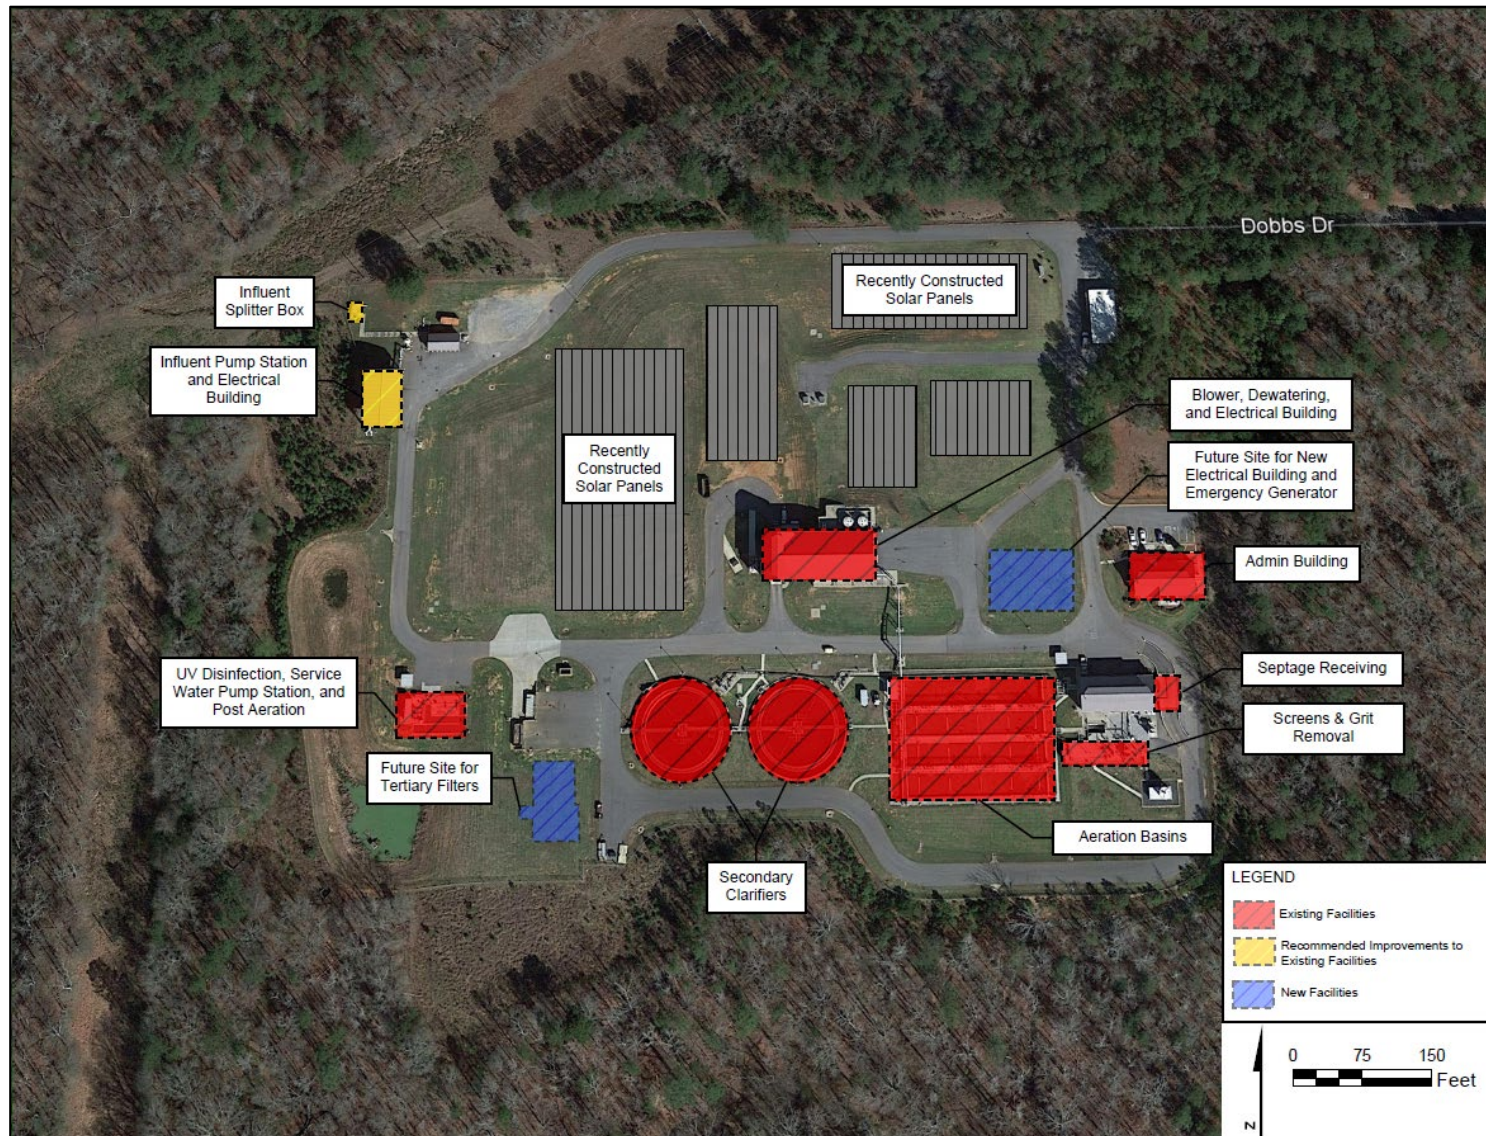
Cedar Creek Water Reclamation Facility Site Plan
